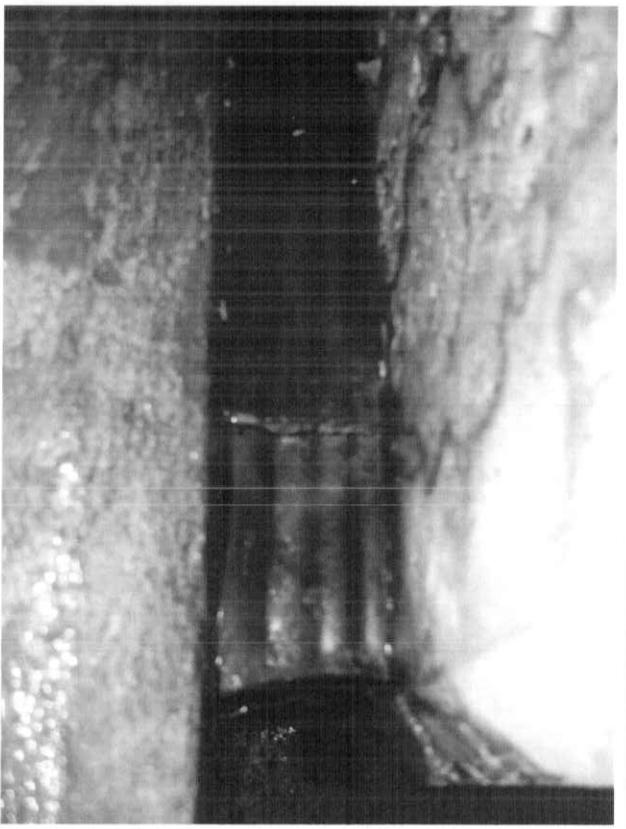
CLOSEUP OF LONGITUDINAL CRACKING IN GIRDER BOTTOMS IN SPAN 3 2.
